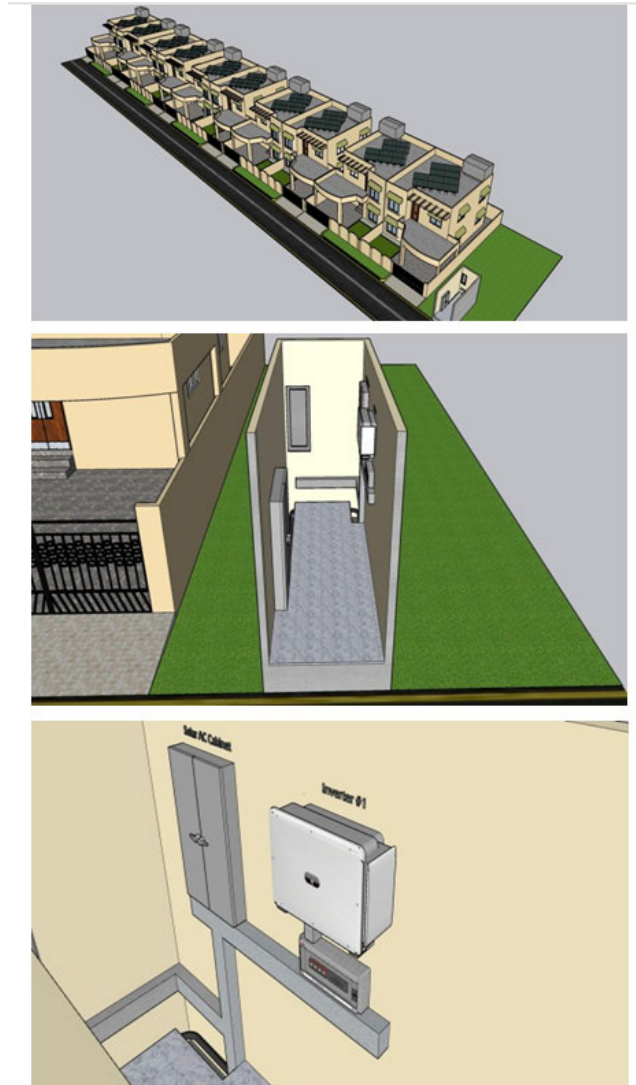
Layout of 50kWp grid tied rooftop PV system.
